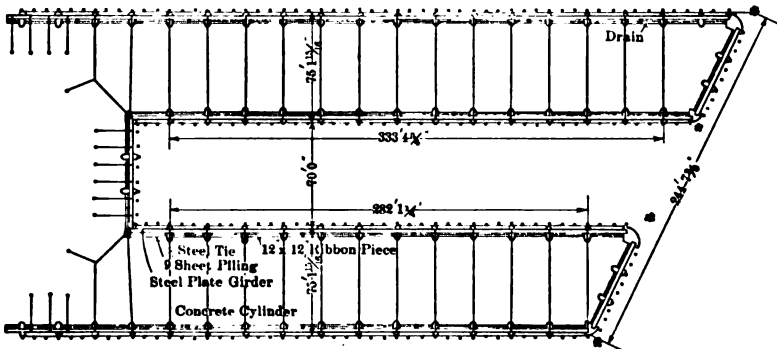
BALTIMORE JETTY PIER PLAN.
